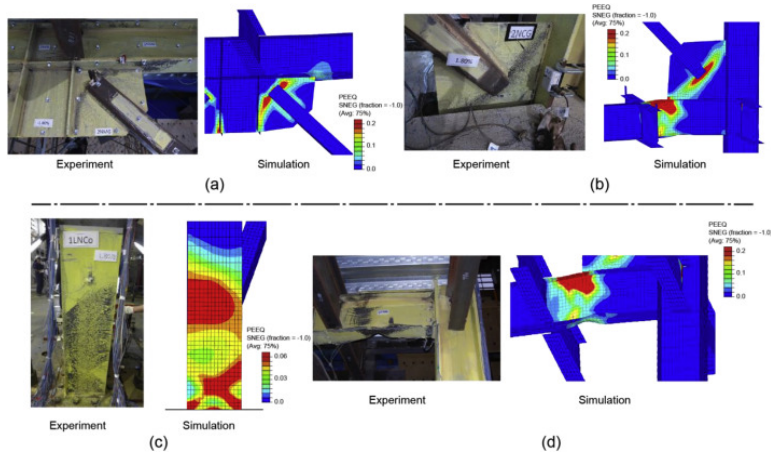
Measured and simulated (Model AB) damage states observed at 1.8% roof drift: (a) middle gusset plate at the second story; (b) corner gusset plate at the second story; (c) column flange at first story; and (d) north beam end at the first story.
